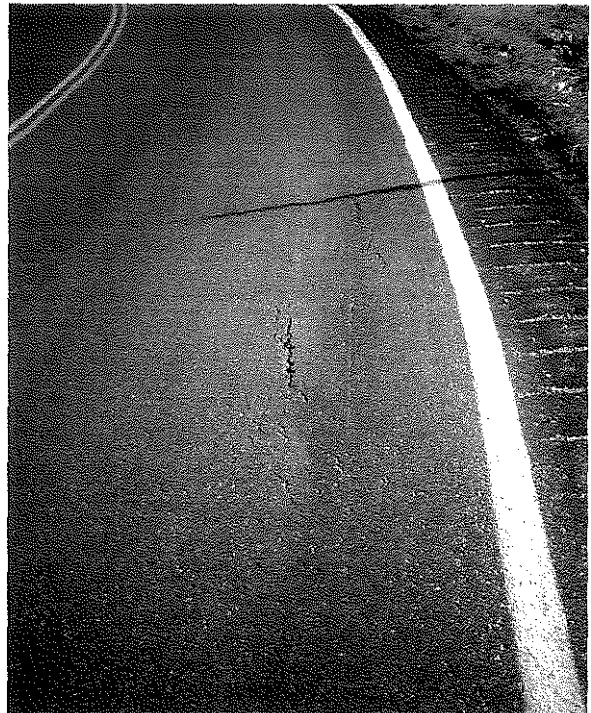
Longitudinal Cracking, Possible Base Failure (KY 550).
